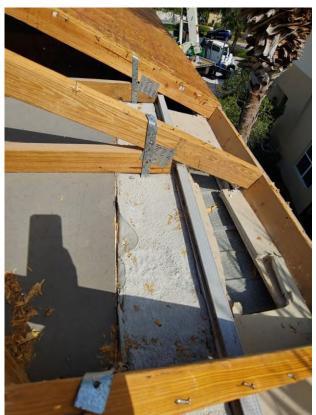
Second layer of underlayment installation was in progress on building 21711.
